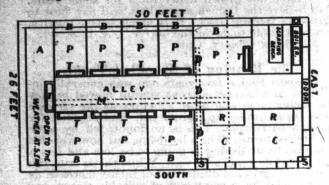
FIG L-GROUND FLOOR PLAN OF F. J. COLLYER'S PIGGERY AND HENNERY.
